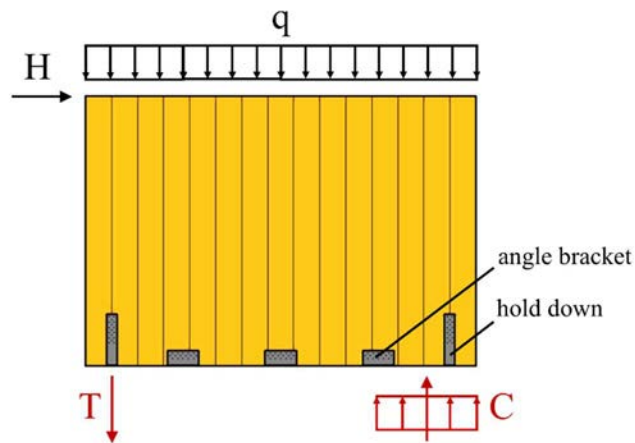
Scheme for the calculation of the seismic load of the shear wall connection system:  $q$  is the distributed load acting on the wall;  $H$  is the horizontal force acting on the panel equal to the shear load absorbed by the angle brackets;  $T$  is the tension force absorbed by the hold-down connector, which, together with the compression force  $C$ , generates the stabilising moment that opposes the one caused by the horizontal force  $H$ .
